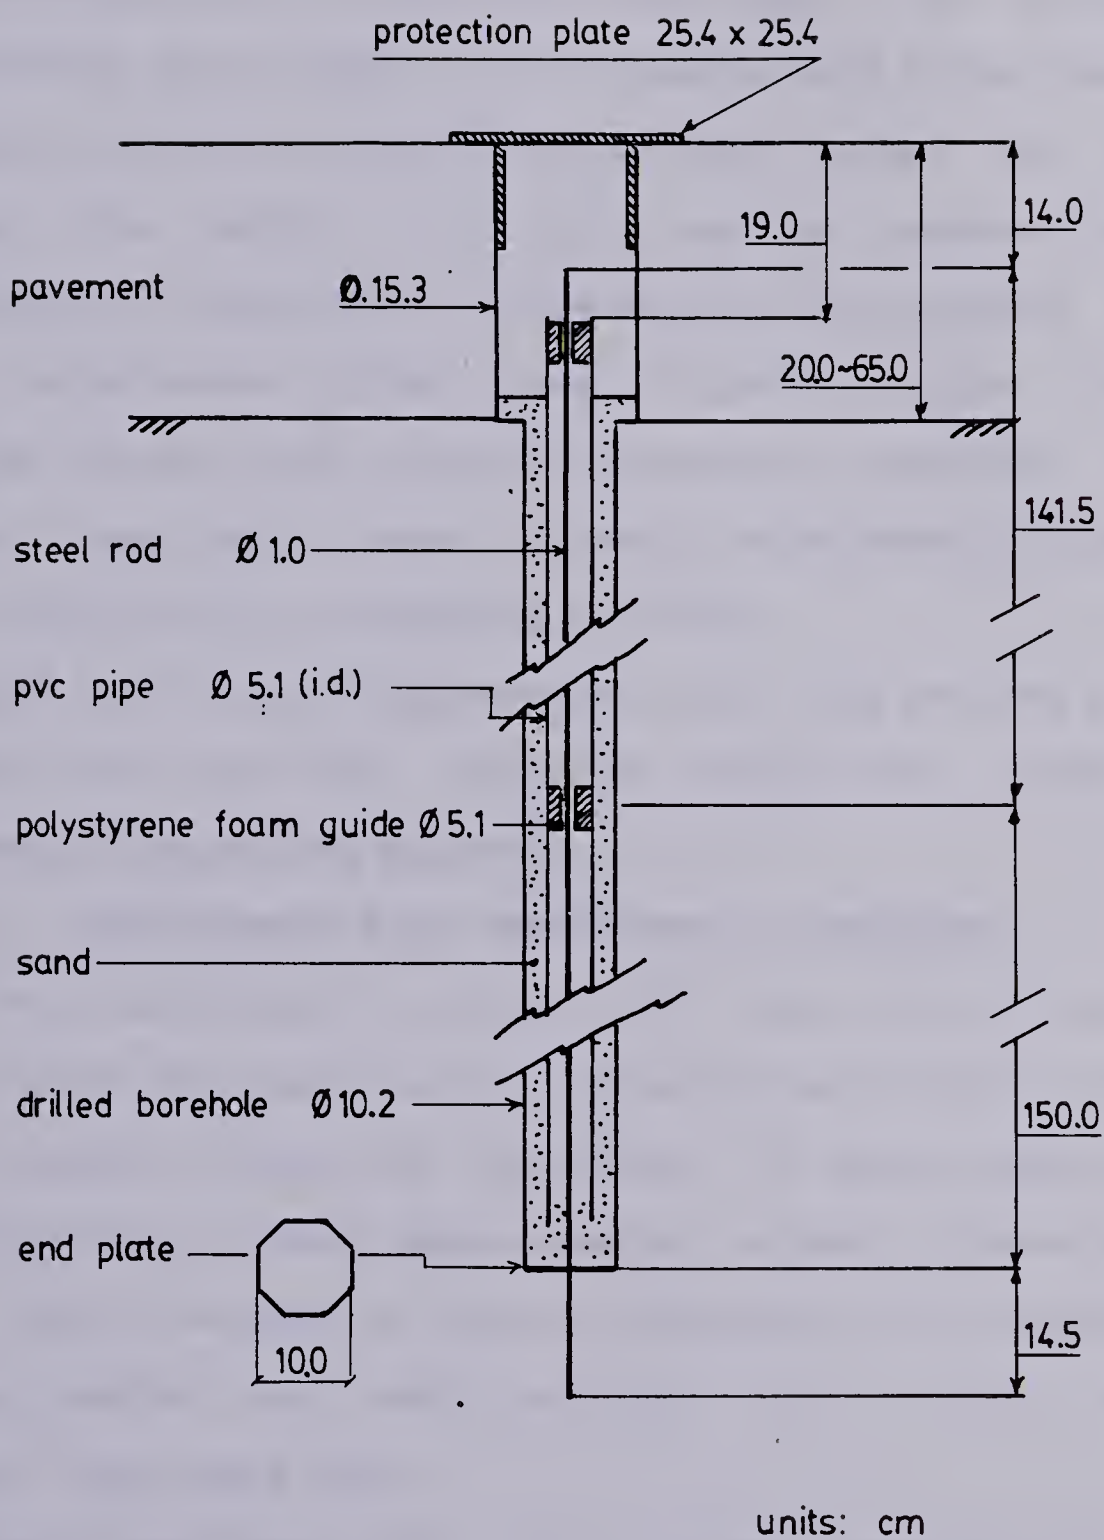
SETTLEMENT POINT - DESIGN DETAILS
